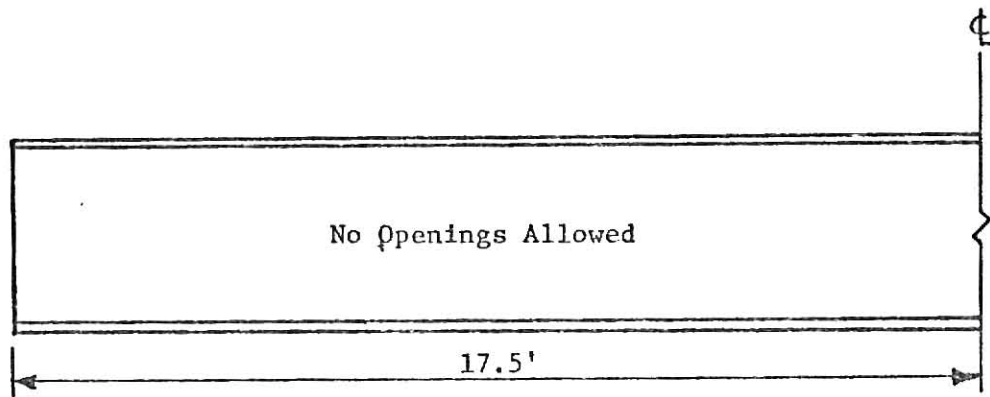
Permissible Opening Locations for Floor Beams with  $A_r = 0$
